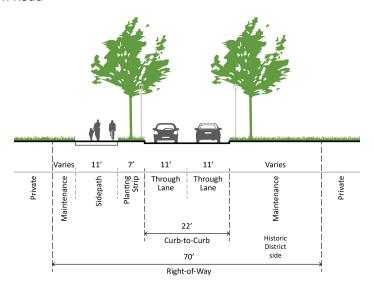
Proposed Typical Street Section for Liberty Mill Road
